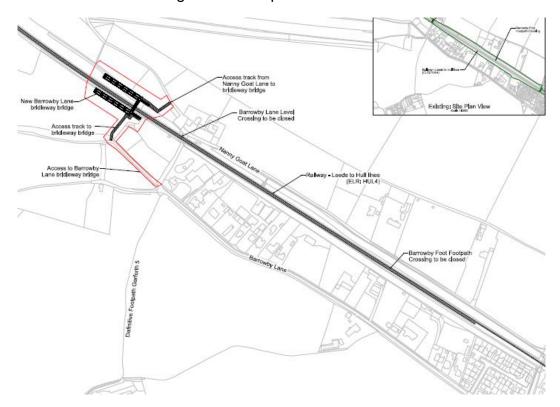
General arrangement of New Barrowby Lane Bridge in context of existing Barrowby Lane and Barrowby Foot level crossings.
